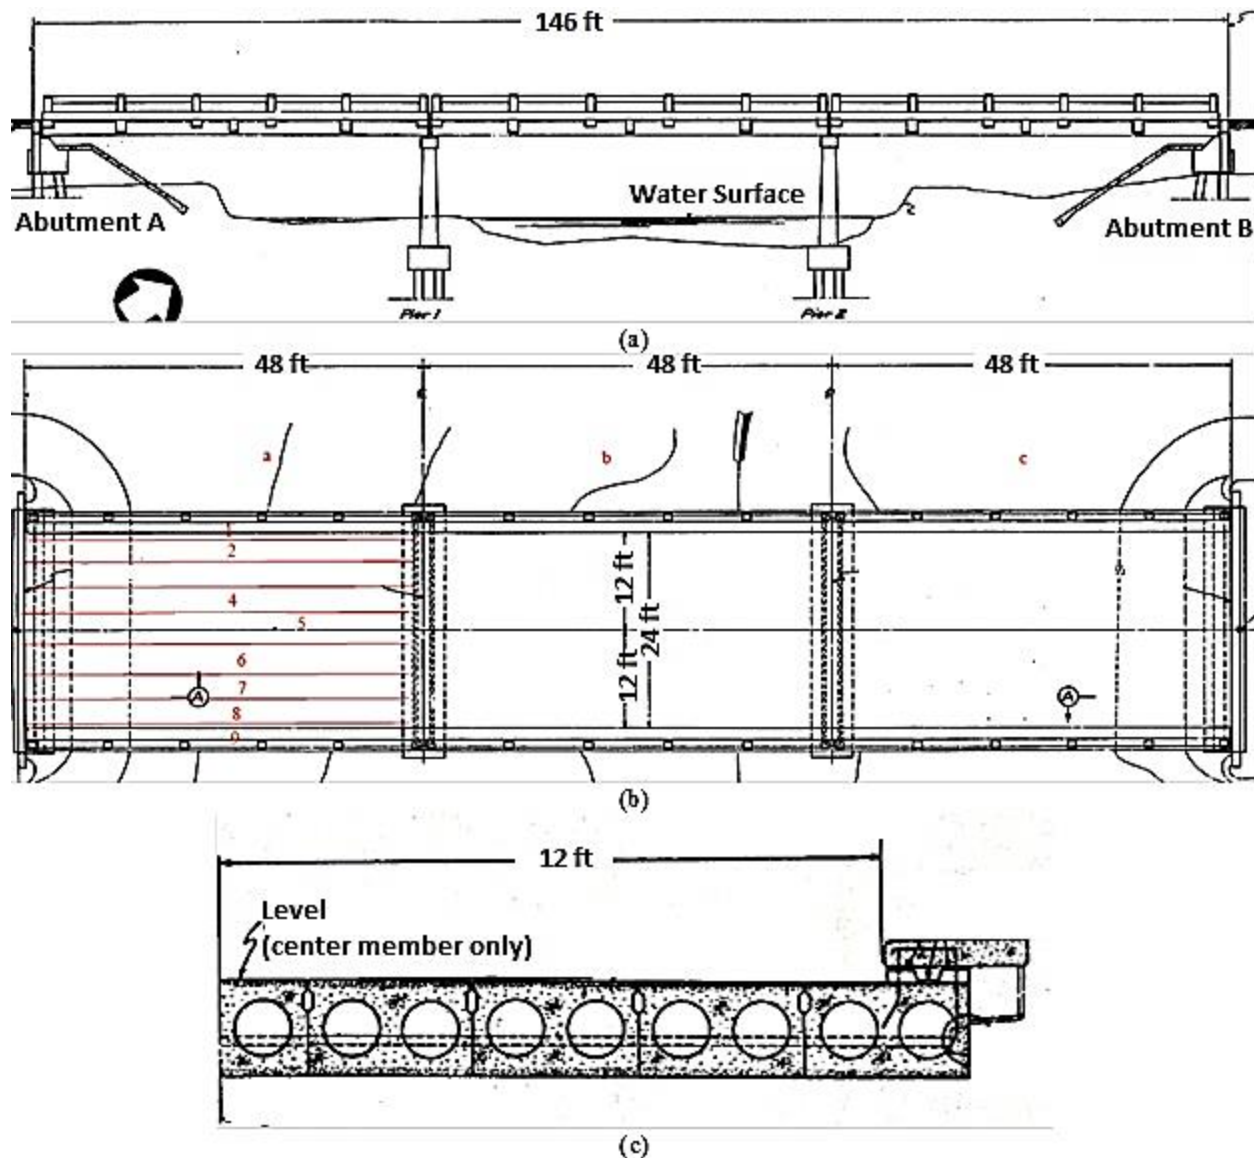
Layout of Qualla Road Bridge: (a) Elevation, (b) Plan, and (c) Cross-Section Views
